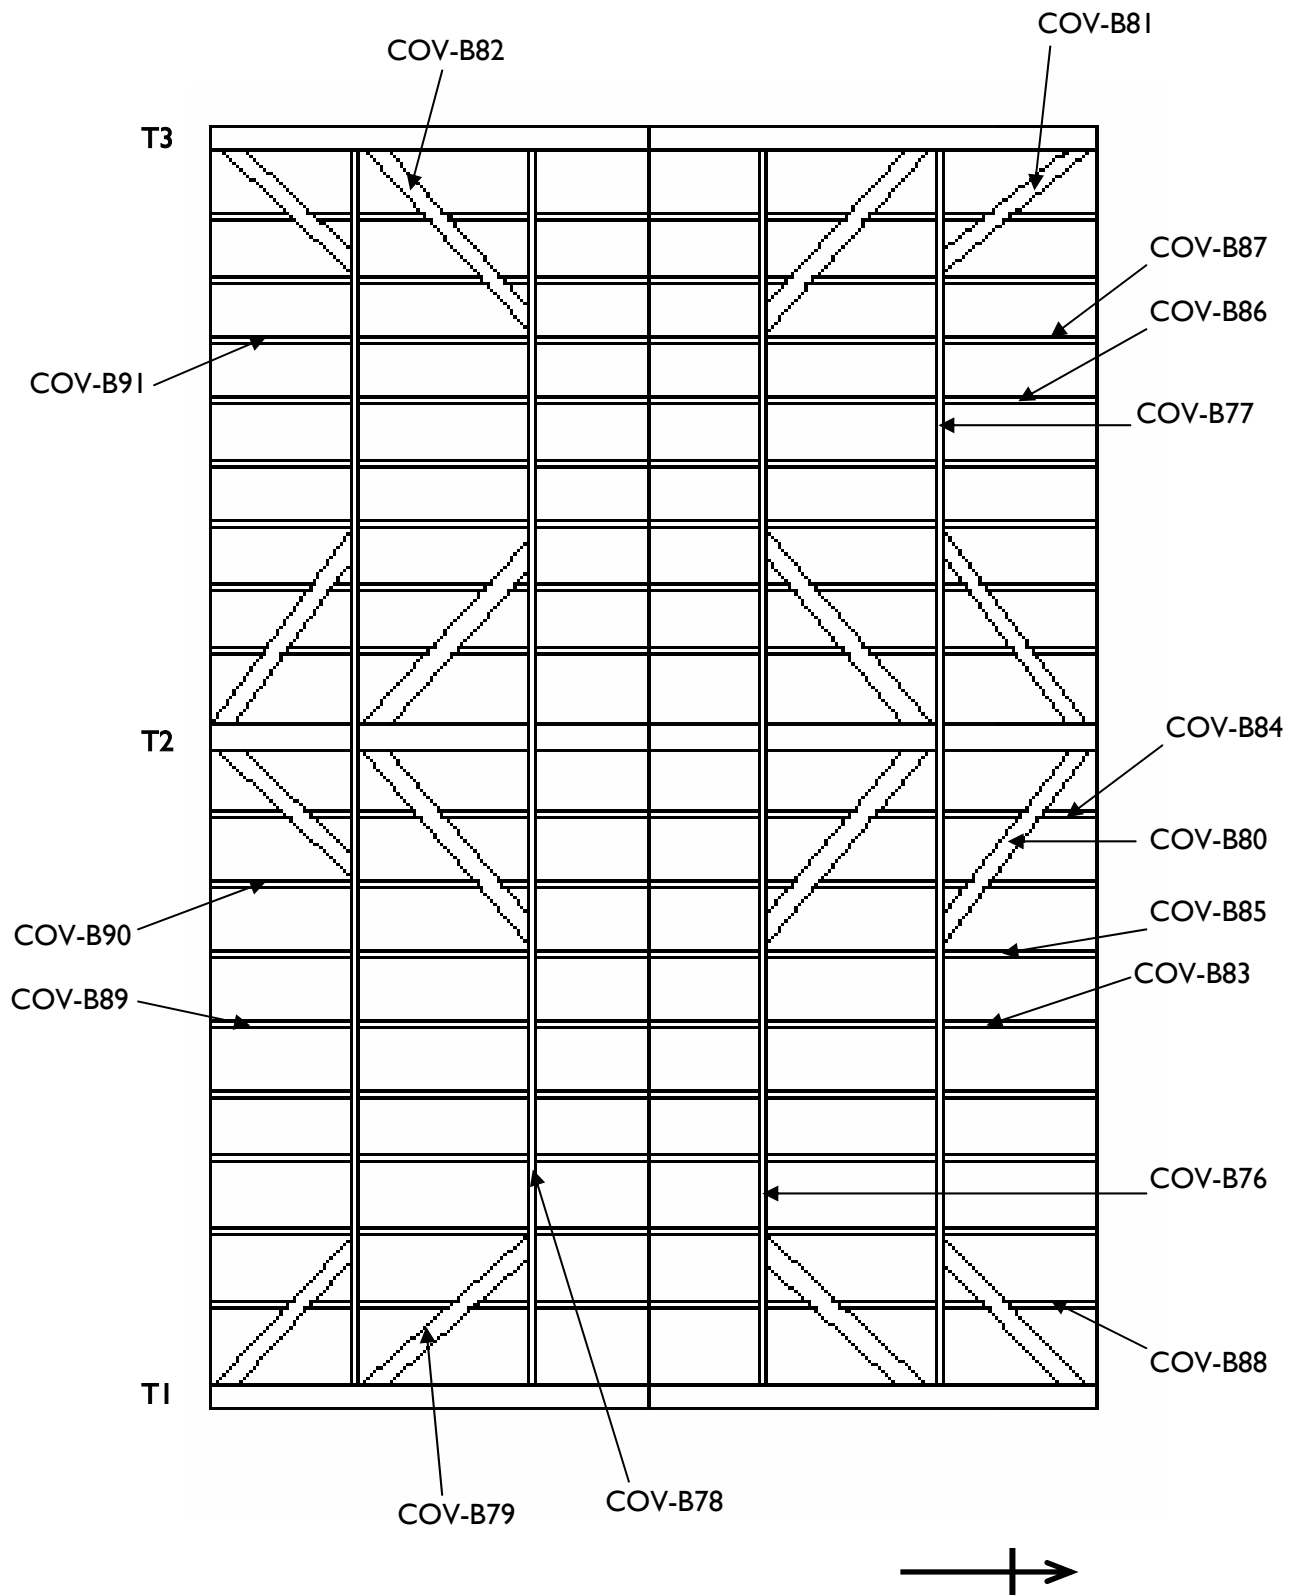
I: Timber-Framed Range, sketch plan of roof, showing the location of samples COV-B76–91
